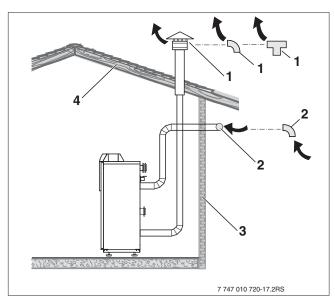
Wall-exit air supply pipe, roof-exit exhaust
